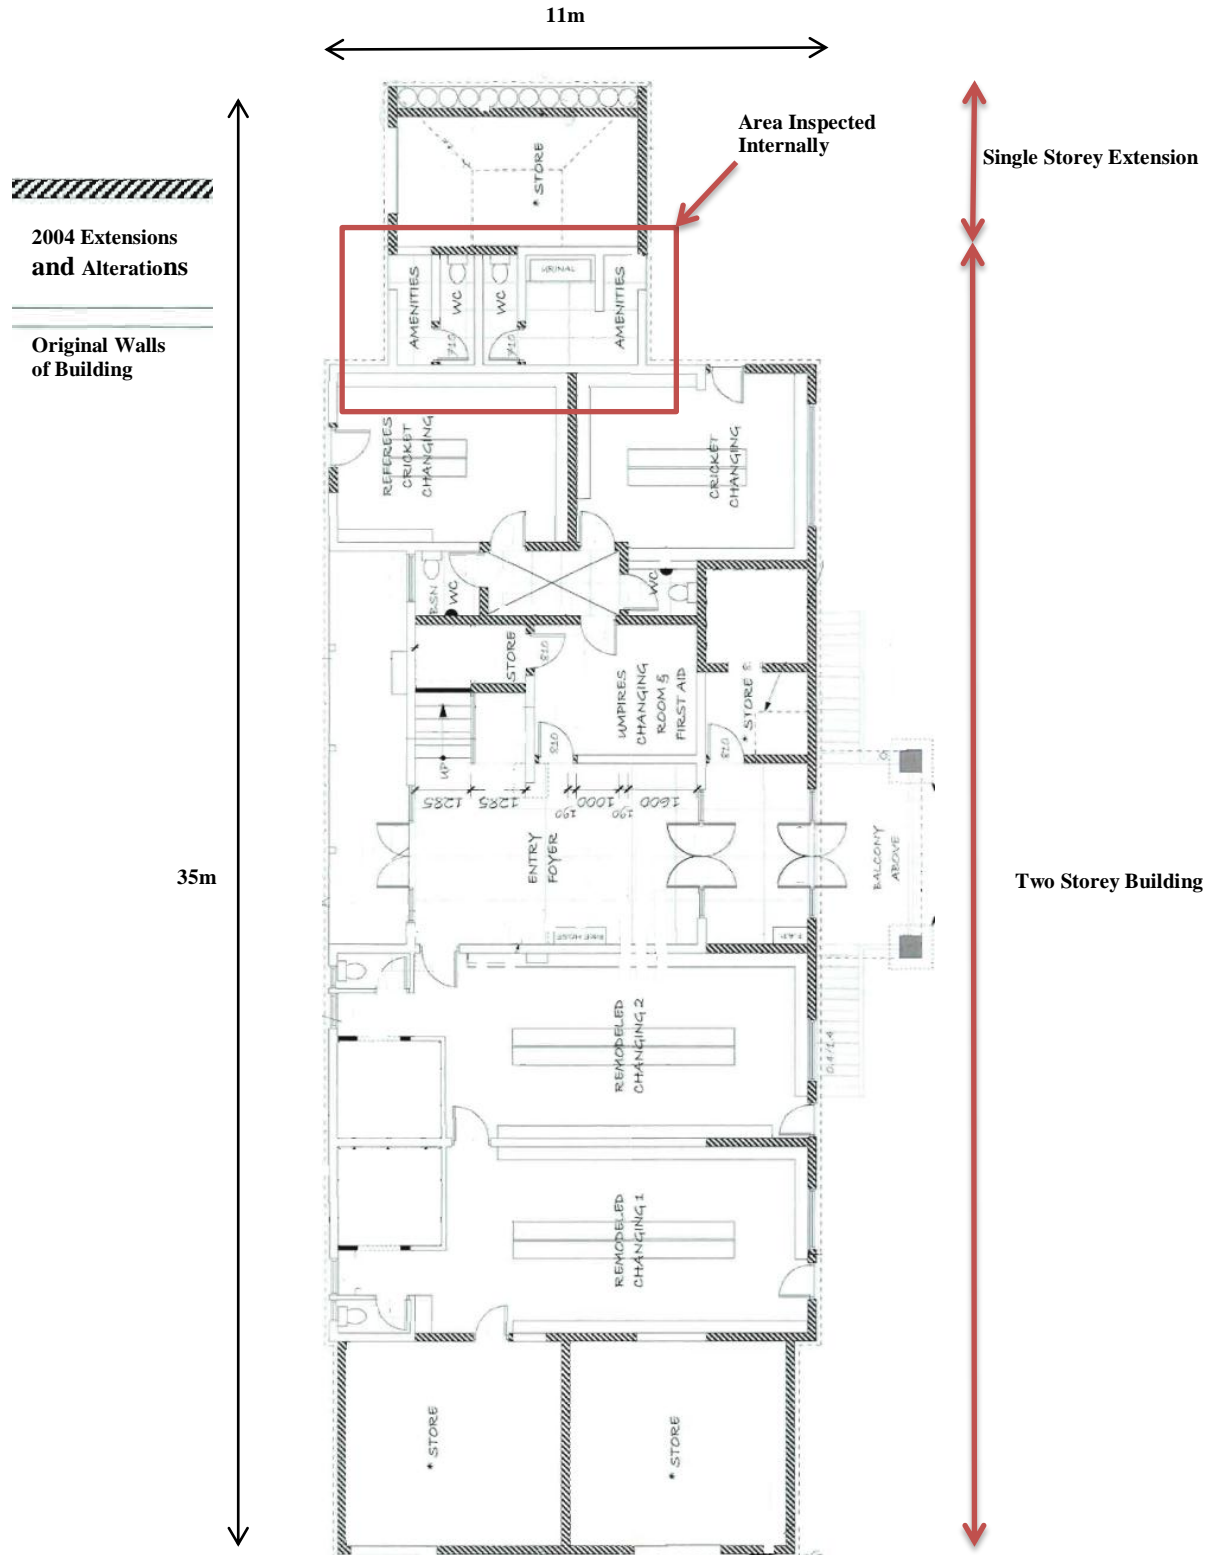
Plan of the Ground Floor Showing Key Structural Elements with Toilets Highlighted
